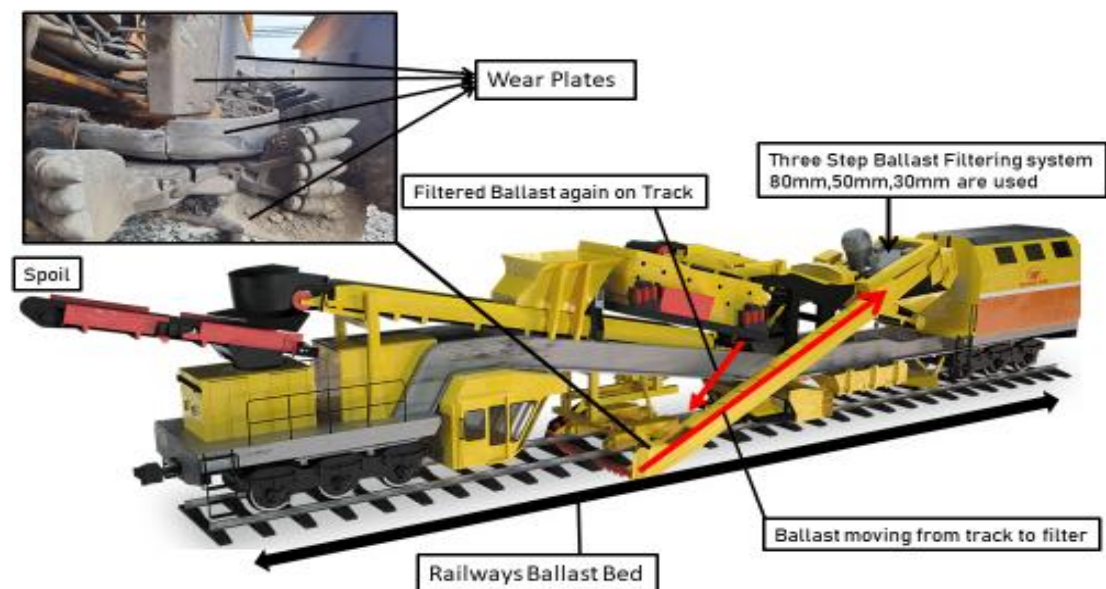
Typical view of ballast cleaning machine and wear plate
